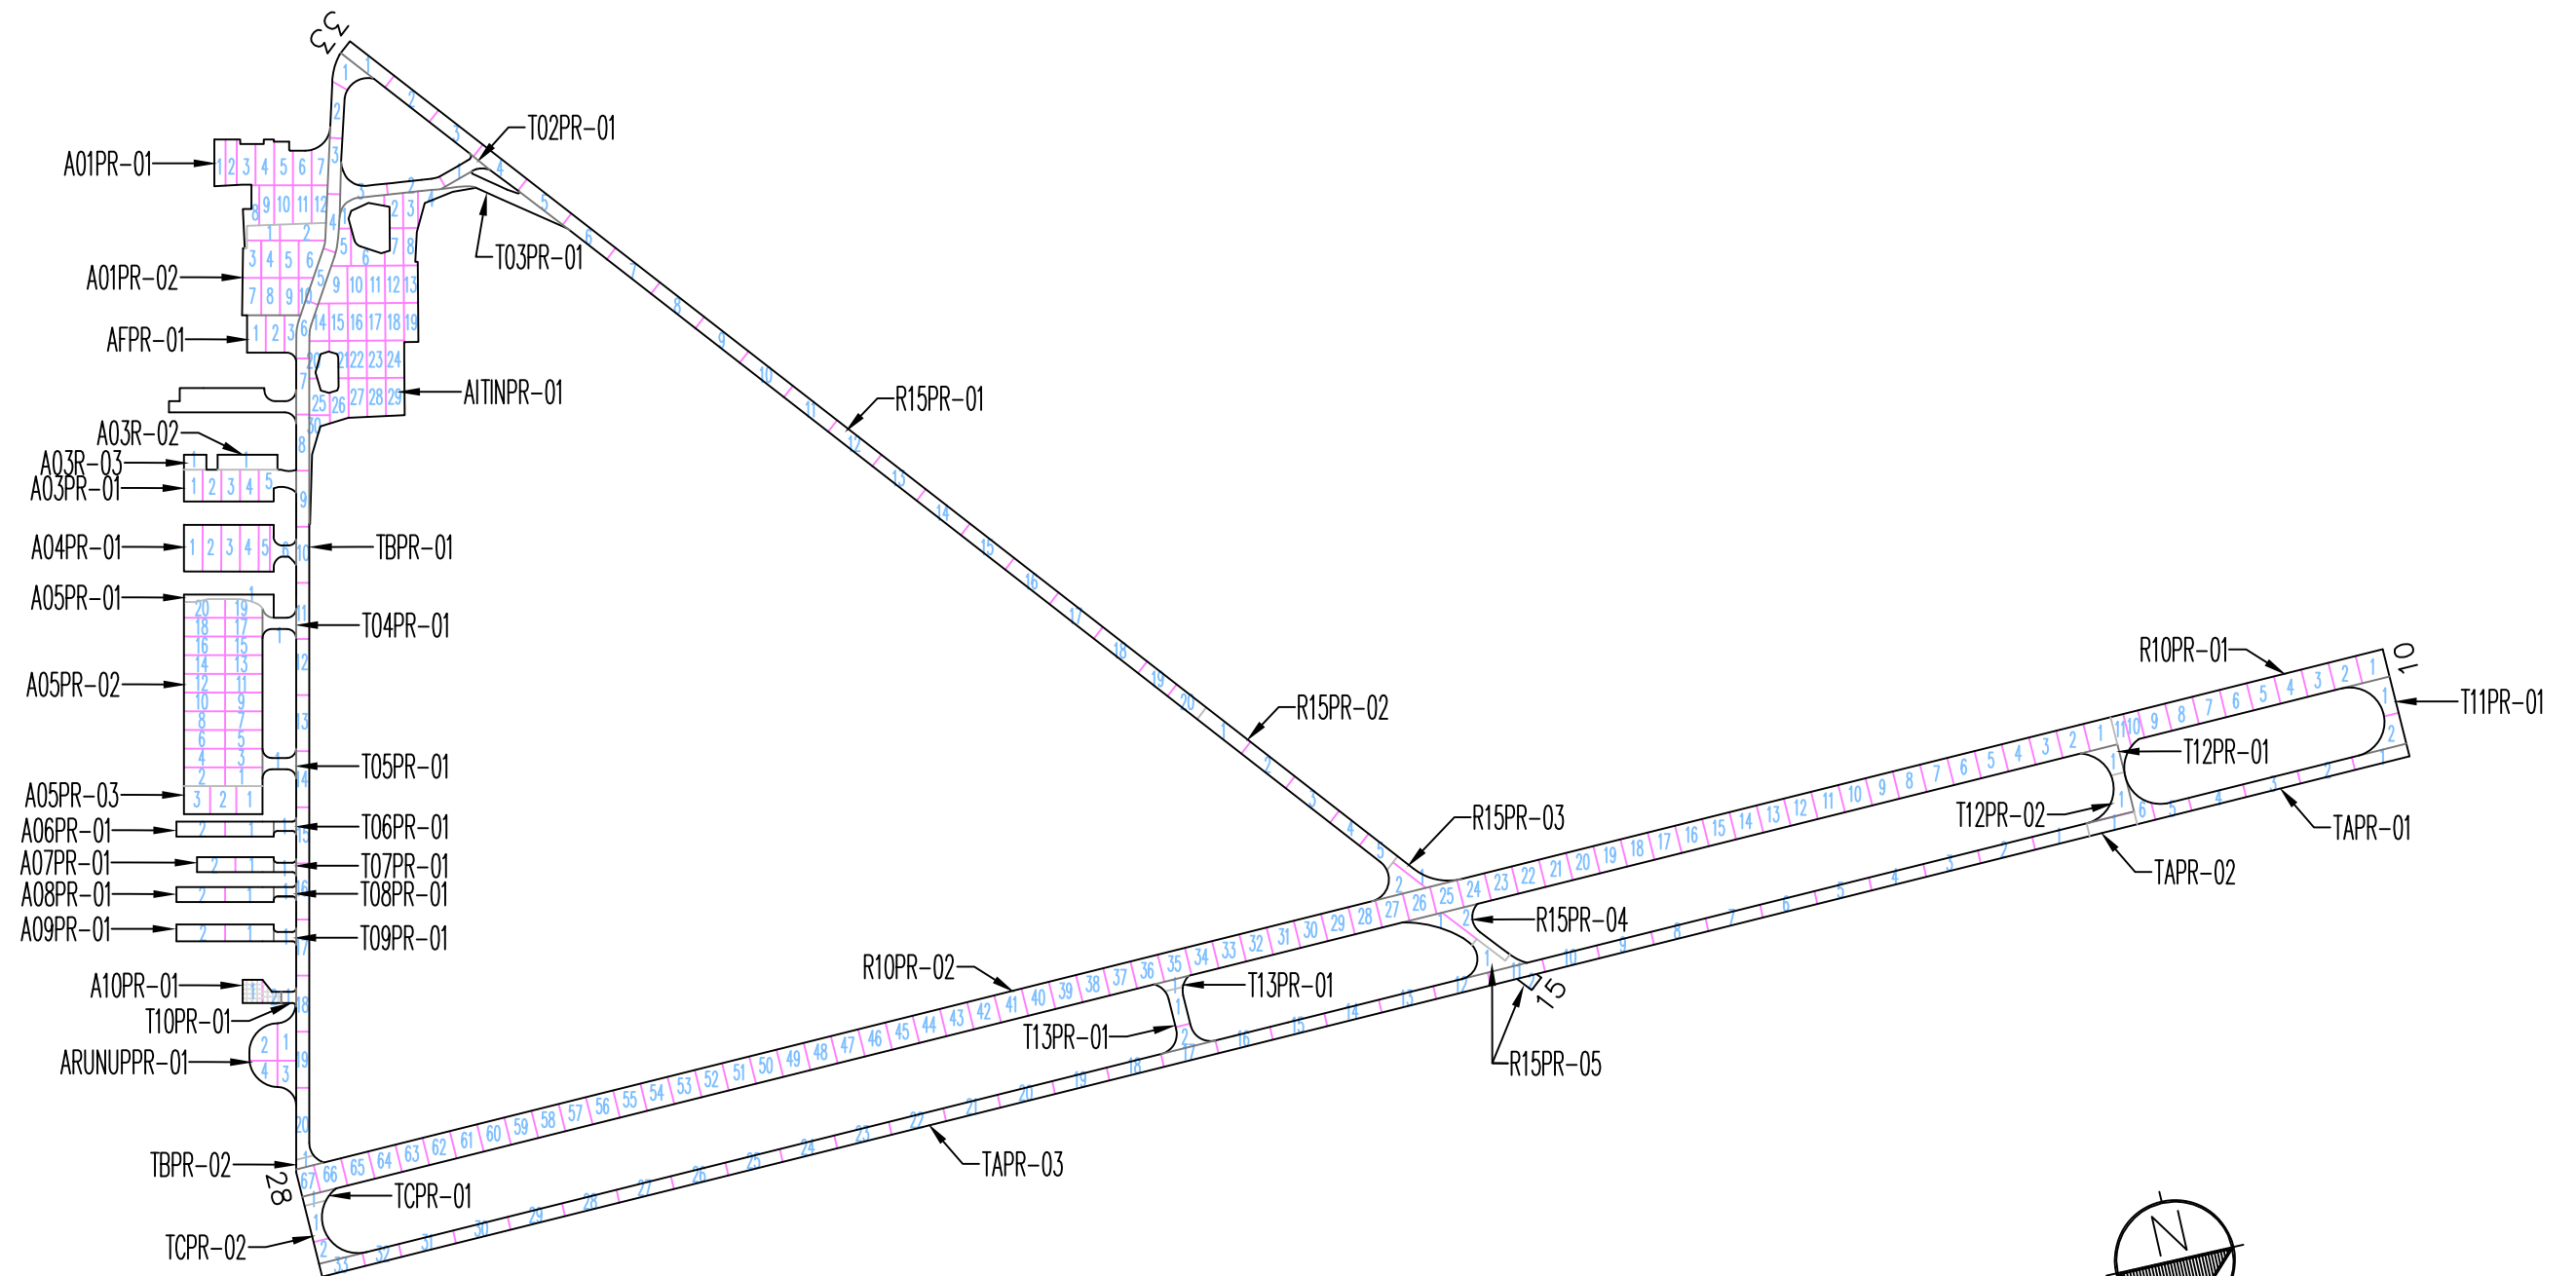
Pavement Branch, Section and Sample Unit Layout.
